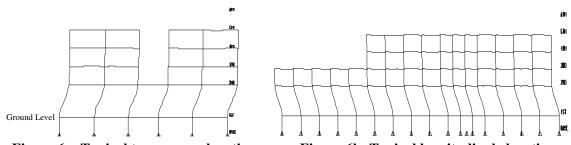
Typical transverse elevation Figure 6b: Typical longitudinal elevation
